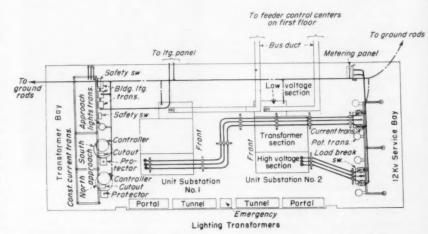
Plan of ground floor electrical room shows layout of substations, 12-kv service bay and transformer bay.
